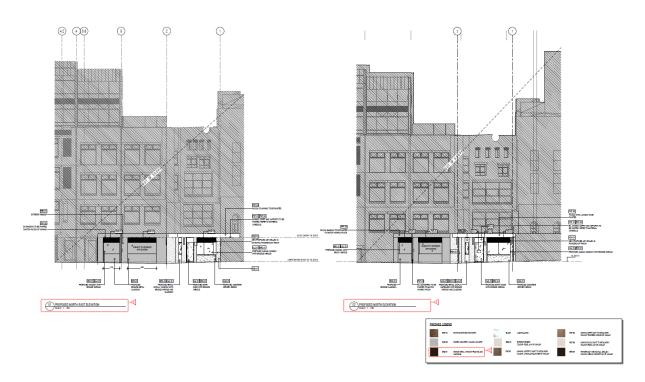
Proposed north-east Foley Street (left) and north Burton Street (right) elevations
